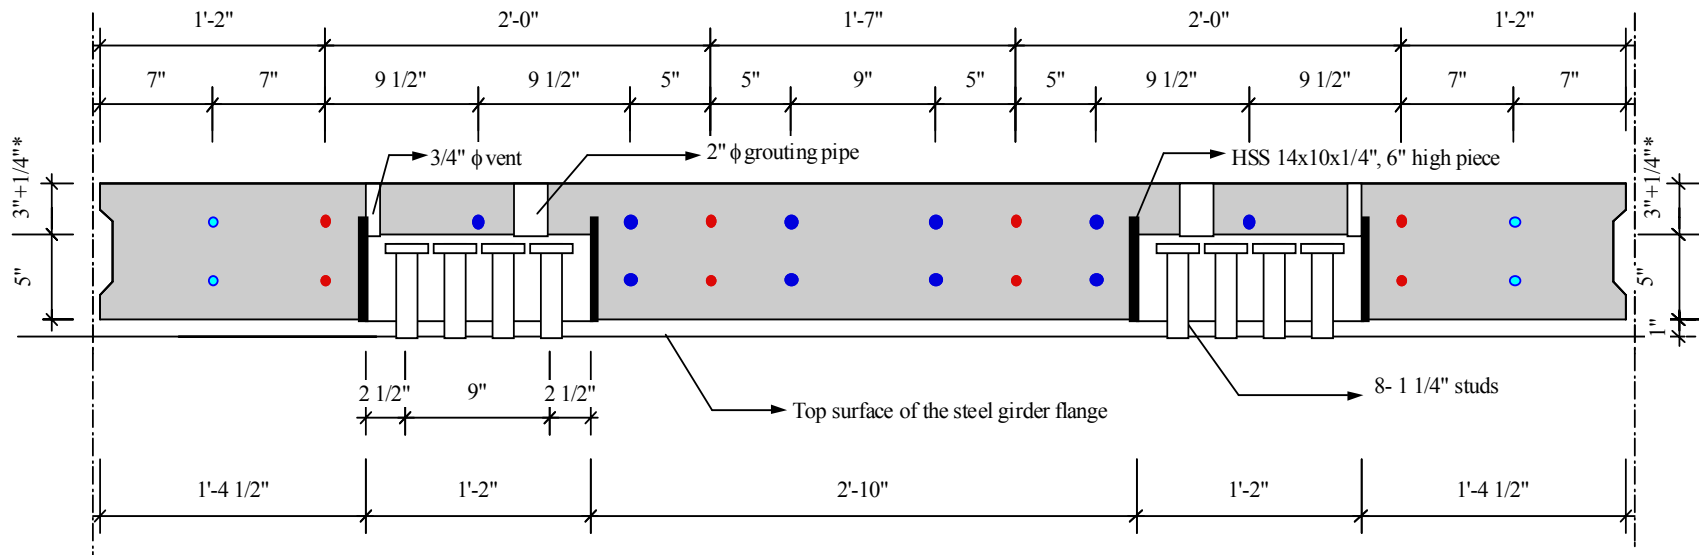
CD-1, Sections C-C & E-E for Steel Girders
